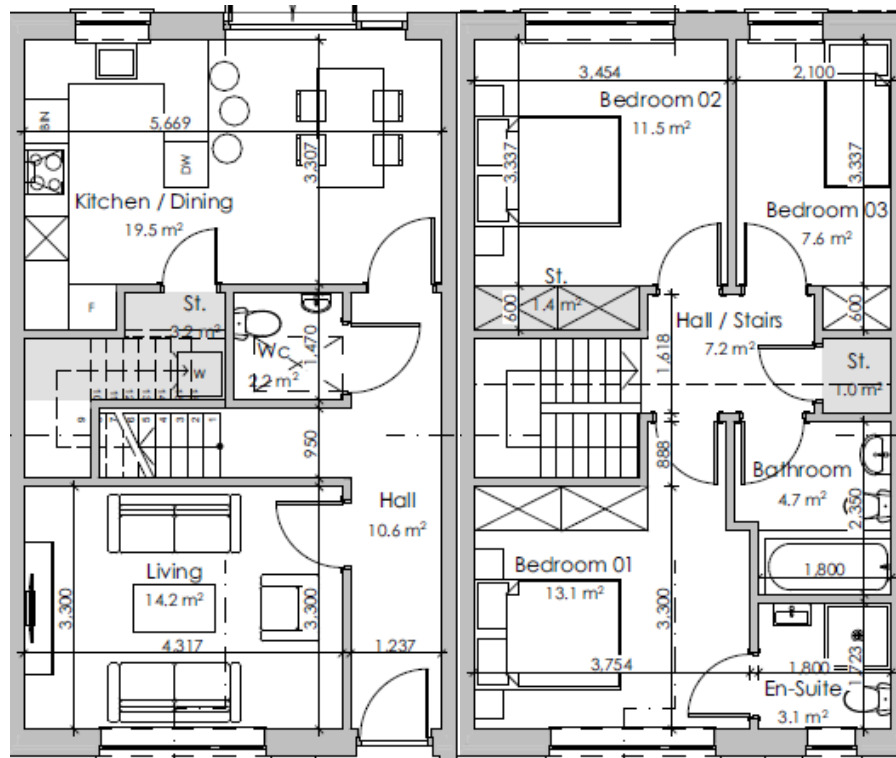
Ground (l) and first (r) floor plans of House Type 3.2.
